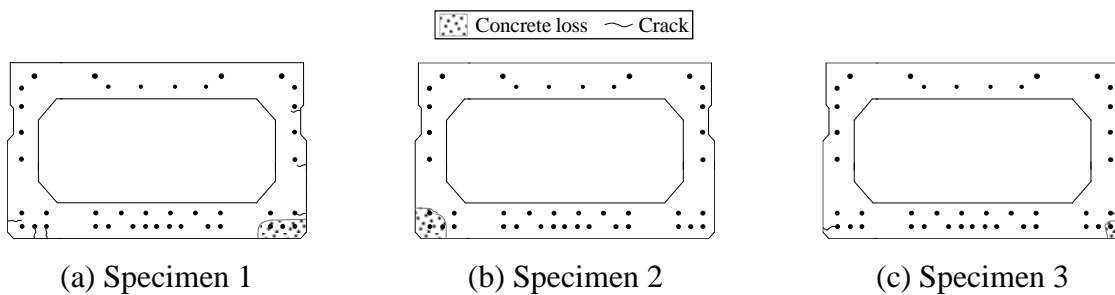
Typical observed damage for girders with a box-section
